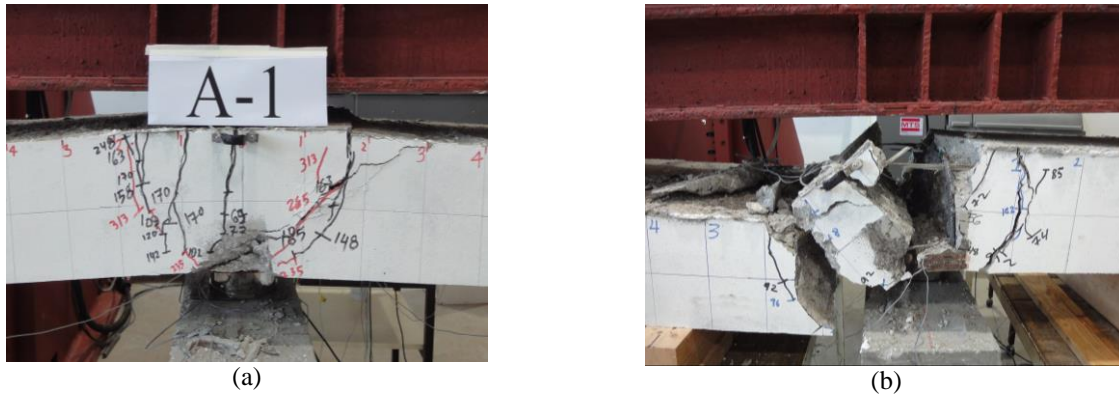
(a) Concrete crushing for specimen A1 and (b) BFRP rupture for specimen B3
